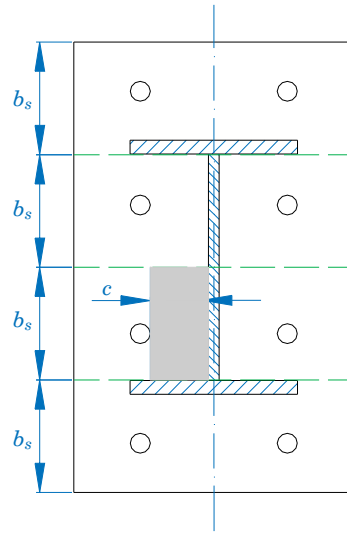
Width of interaction of plate b_s per one bolt and distance c from the edge of the hole to the outer edge of the weld
